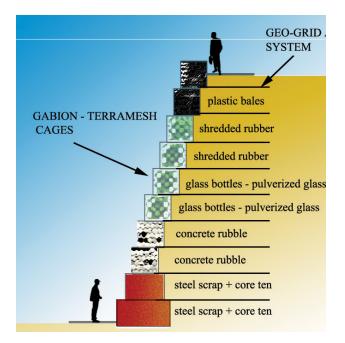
Proposal. Bruce Levin. Source: Bruce Levin K.S.M. Landscape Architects
